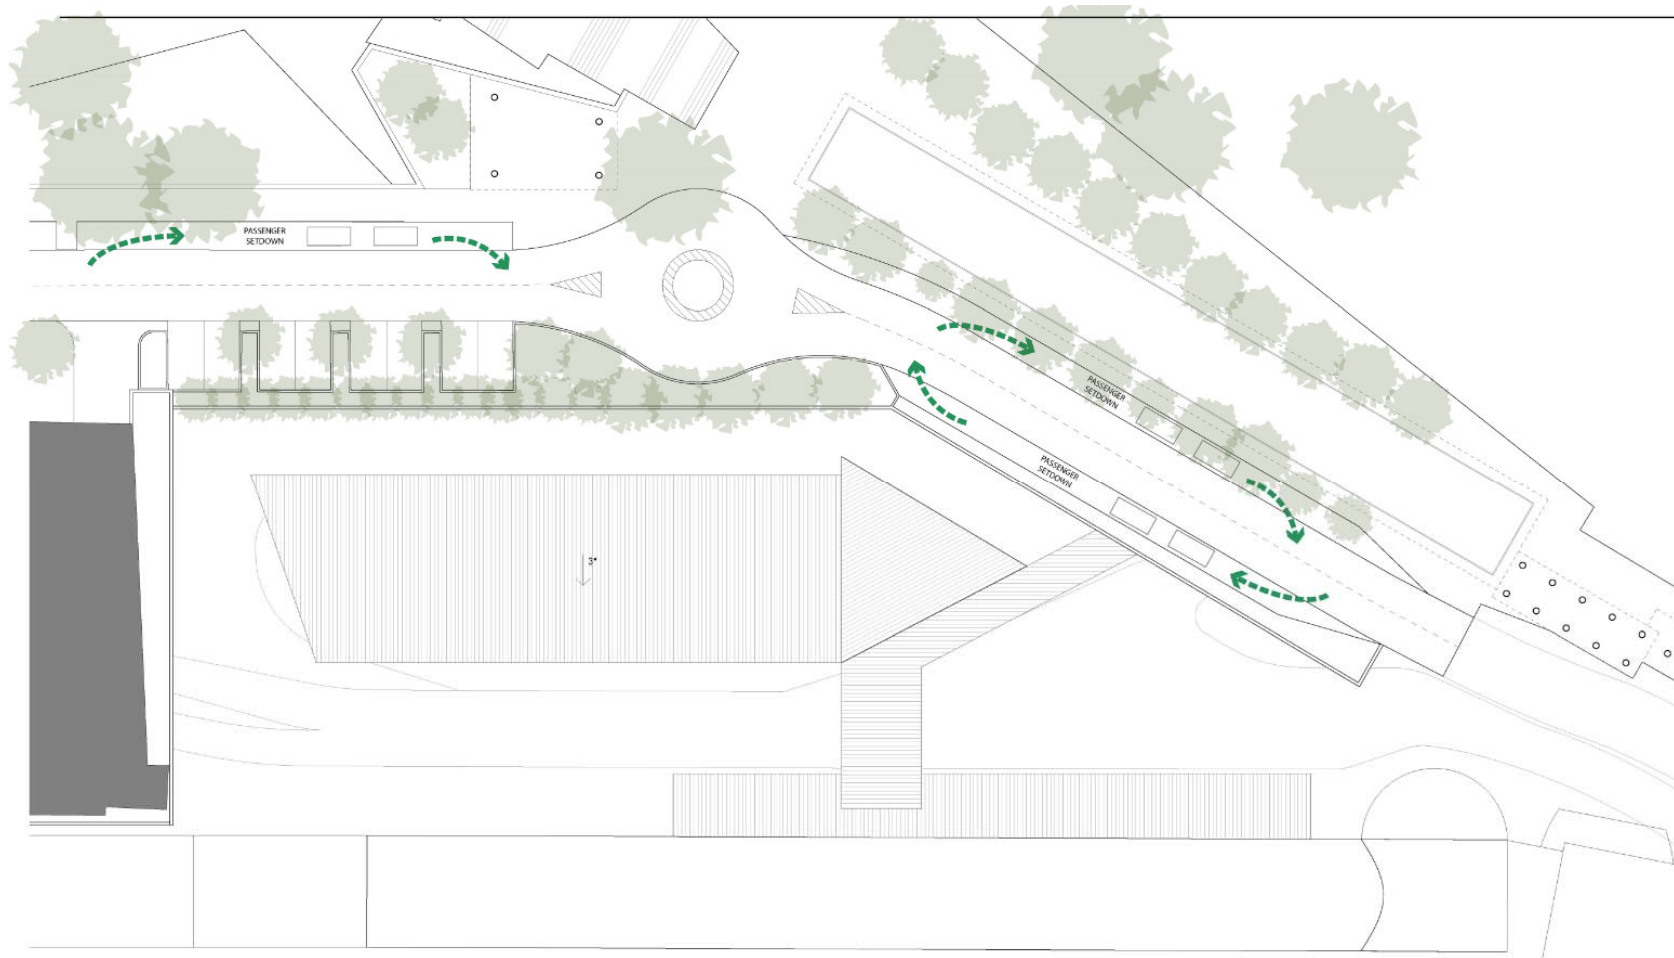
2018 proposed coach terminal layout at Parkland Boulevard
